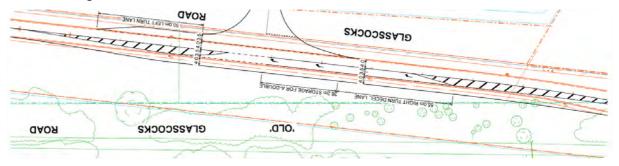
Concept Interim Intersection Design - Glasscocks Road / Site Access
